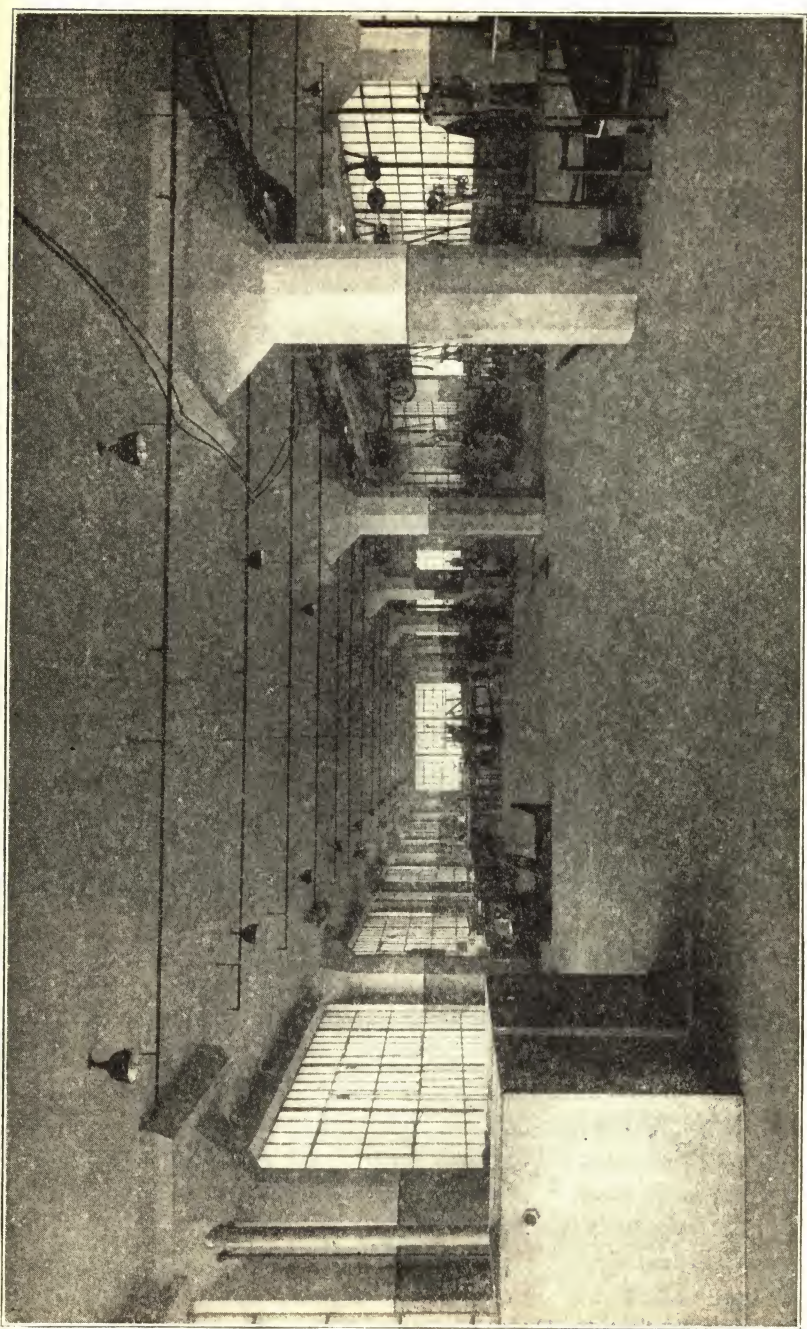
Interior of H. T. Heinz Company Warehouse, Showing Example of Flat-Slab Ceiling Construction
